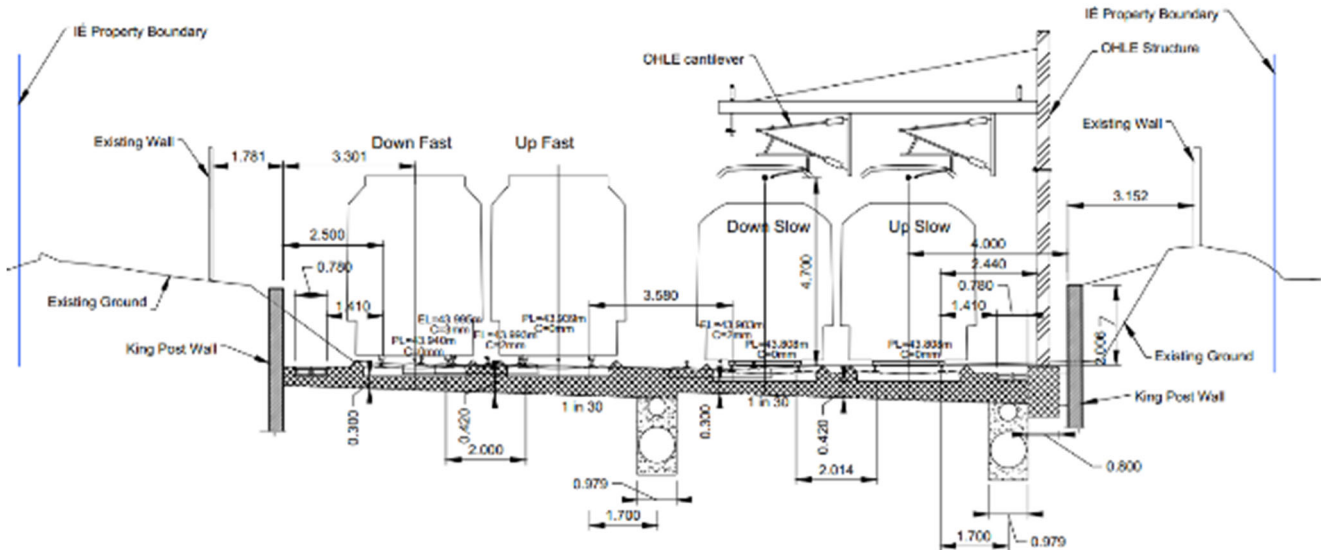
Network 1 Cross Section from Cherry Orchard Footbridge (OBC8B) to Kylemore Road
